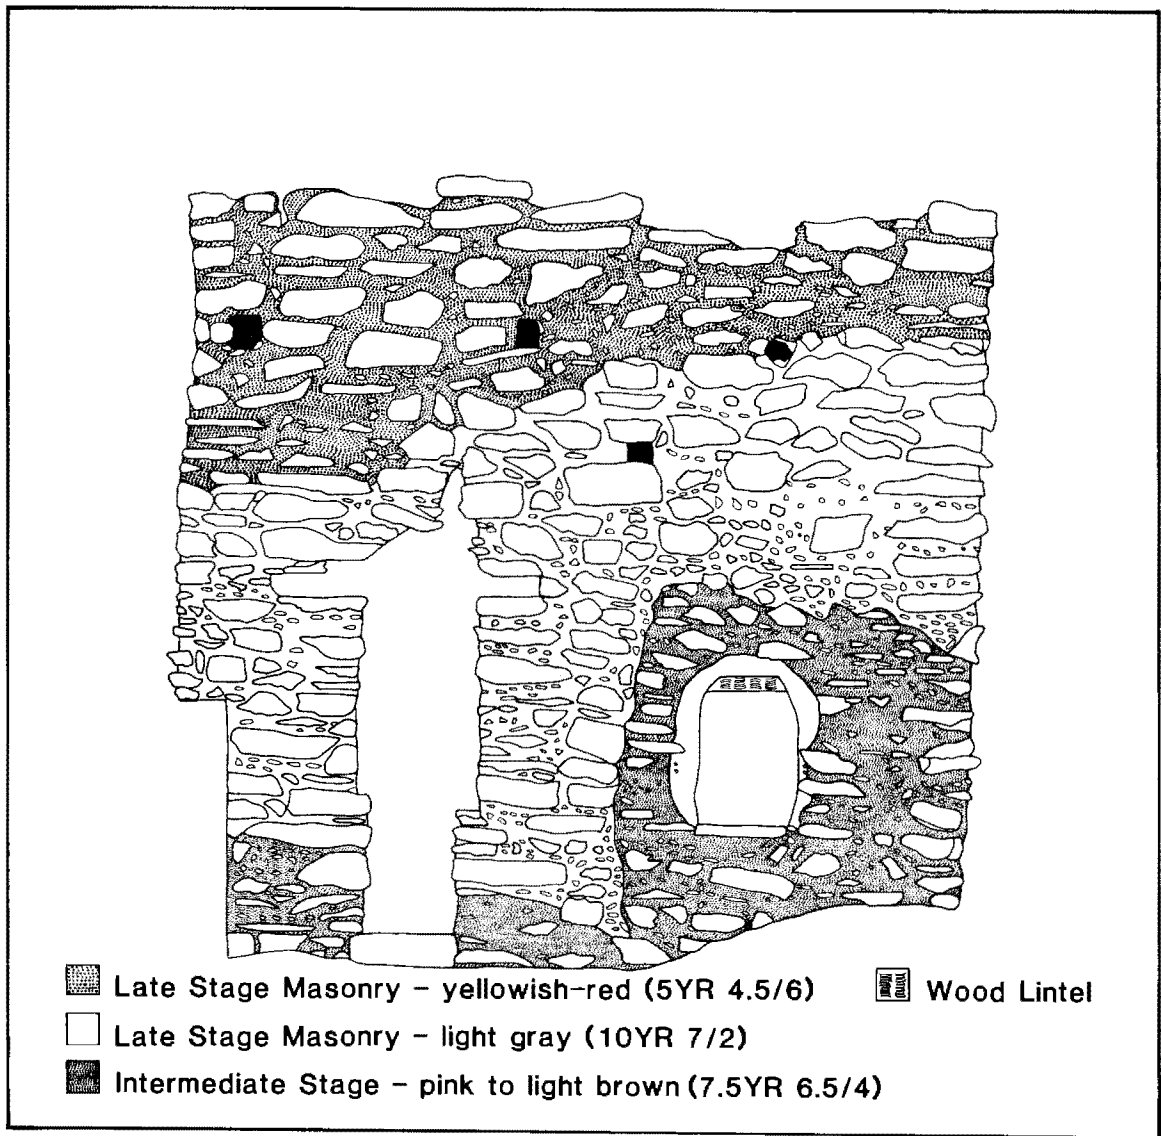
Sketch of Intermediate and Late Stage Construction Showing the East Wall of Rooms 8 and 9 in Room Block B. The Darkened Areas in The Upper Part of the Wall are Observation Ports and Not Associated with Roof Construction
